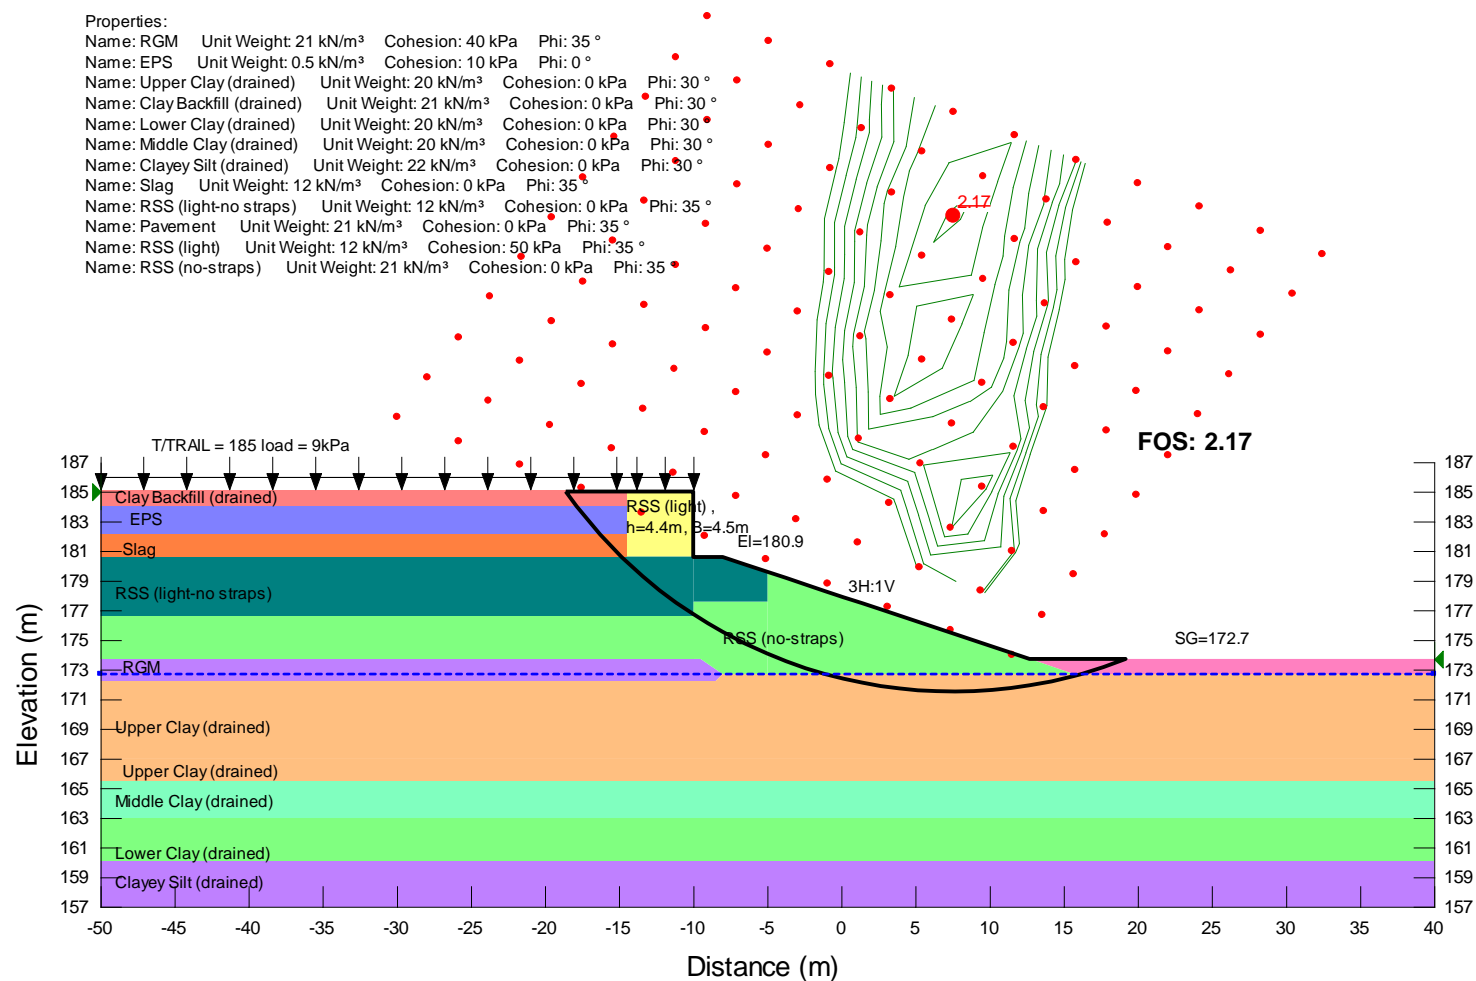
Slope Stability Result – North Abutment Return Wall – Long-term (Drained) Loading
